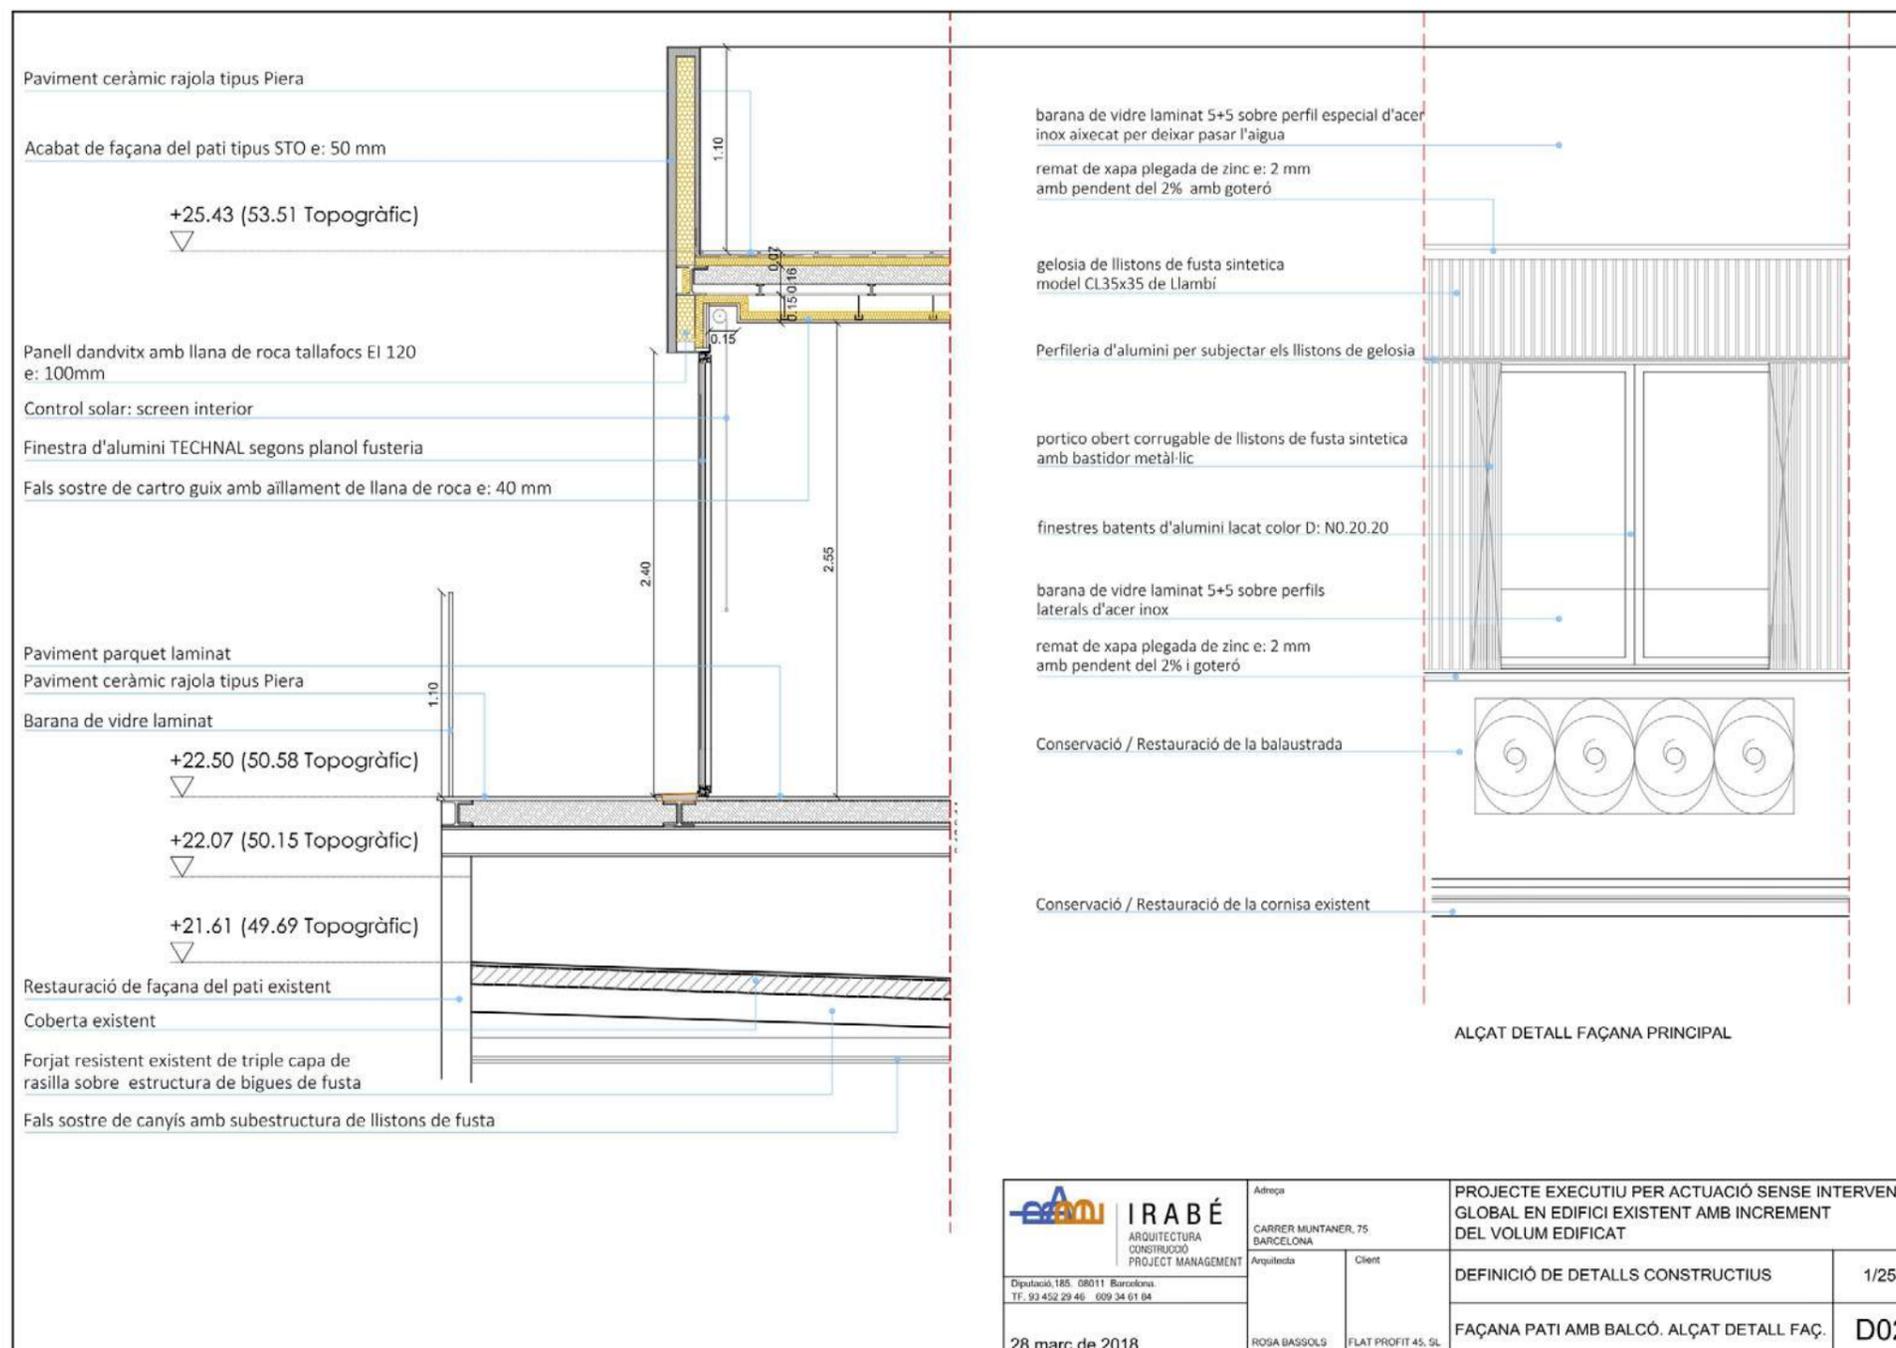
Construction detail of the module, courtyard façade with balcony and main façade to the streets.
